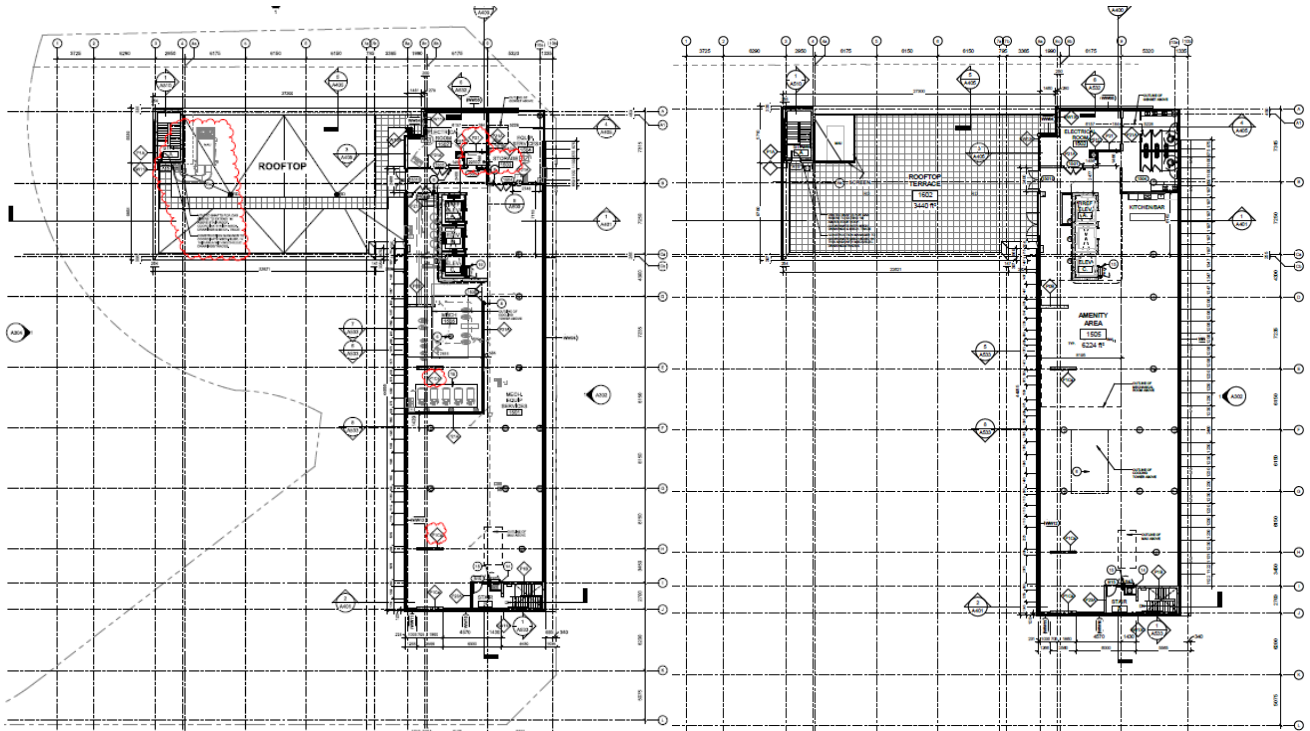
Floor Plan Comparison – (Left) Approved (2020) 15th-storey Floor Plan; (Right) Revised (2022) 15th-storey Floor Plan with the reconfigured indoor amenity space and rooftop terrace.
